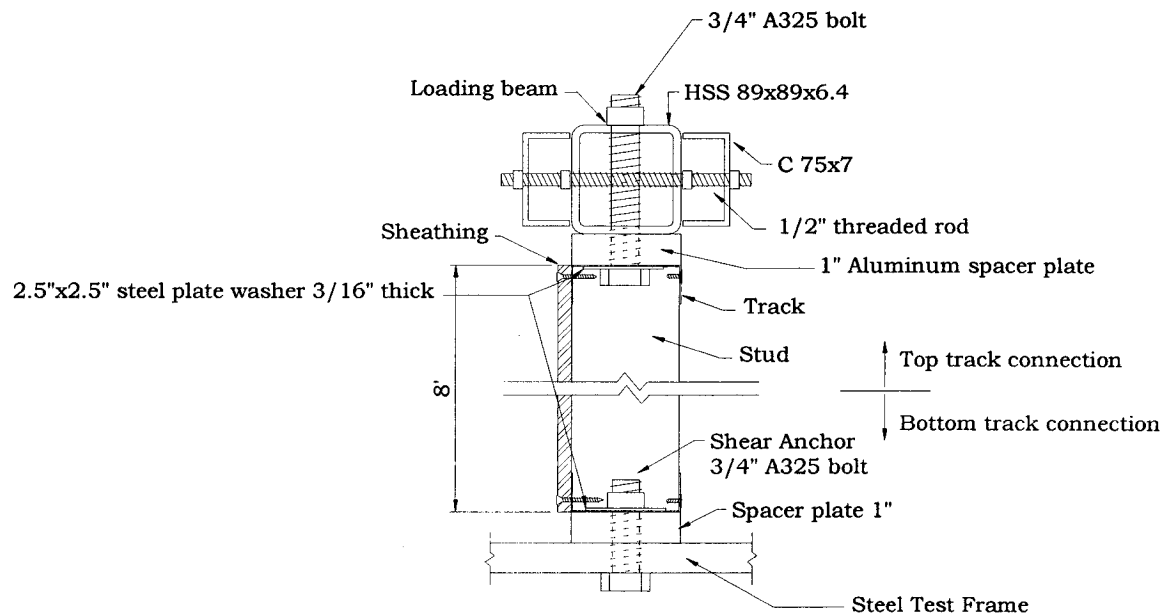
Detail of loading beam and its components as well as the top and bottom track connections
